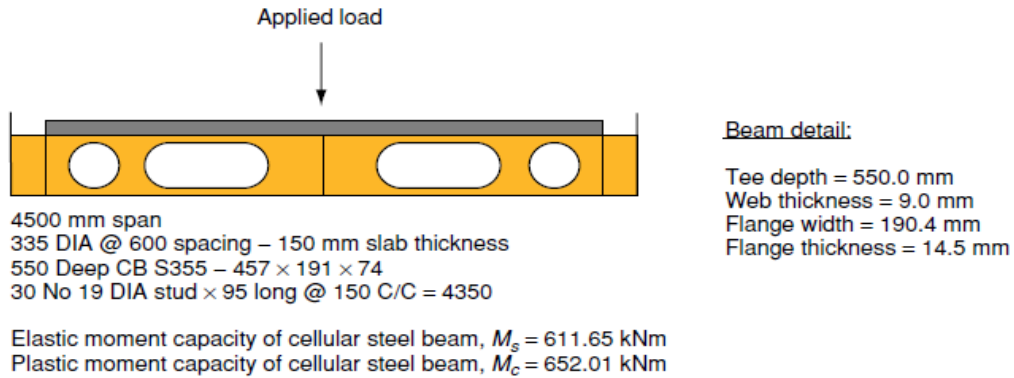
Detail of asymmetrical cellular beam(2) with one point load (El-Hadi Naili,2011)
